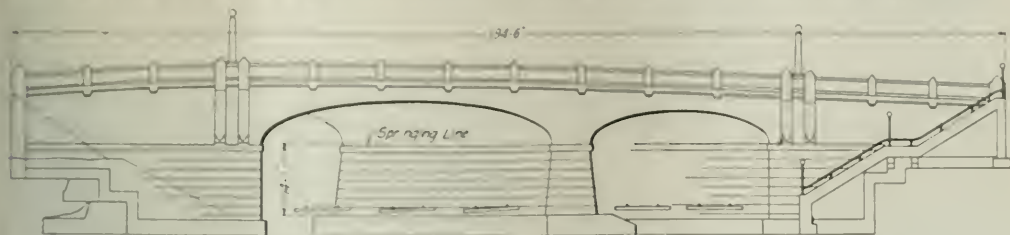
An Unsymmetrical Two-Span Arch Bridge Over the Tracks at Sneed's Crossing
